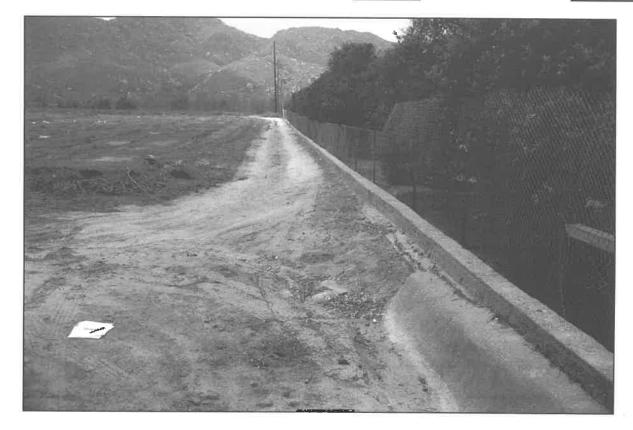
jpg: View of the site from the center point south along a possibly modern poured concrete retaining wall. Wall ends 100 feet north of Spring Street.
